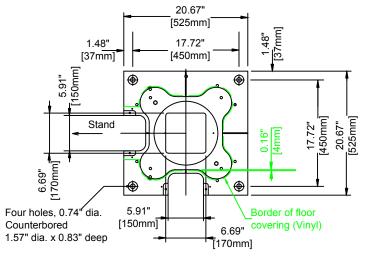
Universal Floorplate - Notes for Installation
